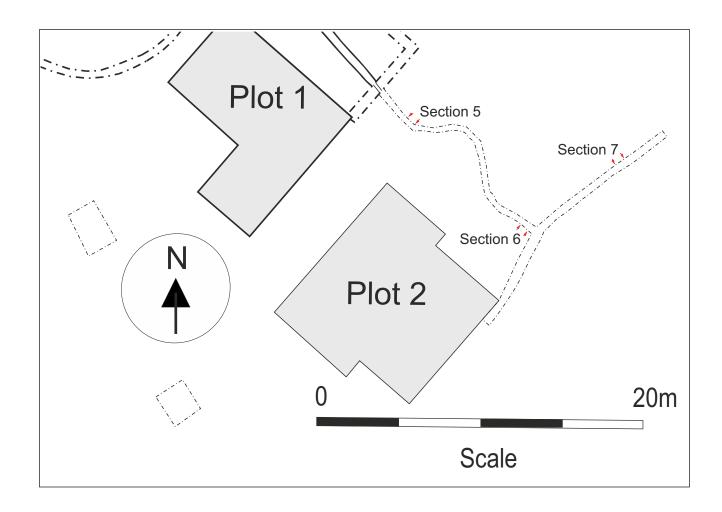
Sections and location plan for southern half of service trenches (sections 5-7)
